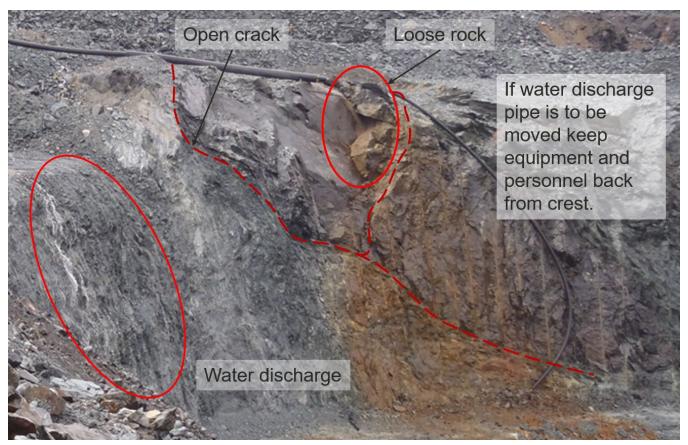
Goose Pit uncontrolled water discharge on north pit wall
